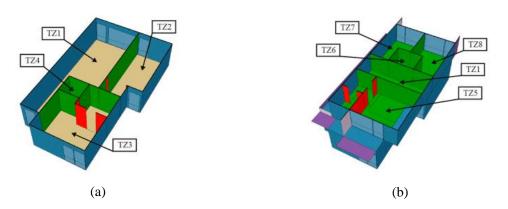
Ground floor (a) and first floor (b) levels thermal zones, where: TZ1 – Hall, living room and staircase, TZ2 – Kitchen, TZ3 –Ground floor suite bedroom, TZ4 – Ground floor bathroom, TZ5 – First floor suite bedroom, TZ6 – First floor bathroom, TZ7 –First floor single room and TZ8 – First floor single room
